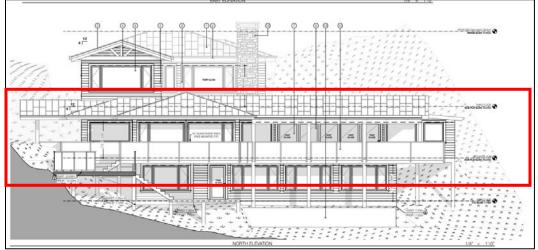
Appendix B – North Elevation– Development Permit - DP000077
